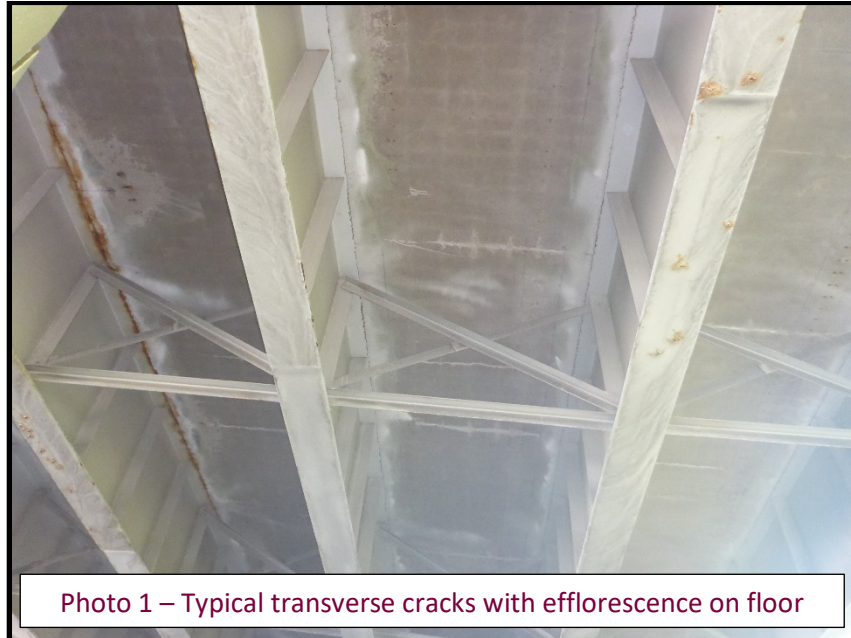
Typical transverse cracks with efflorescence on floor
